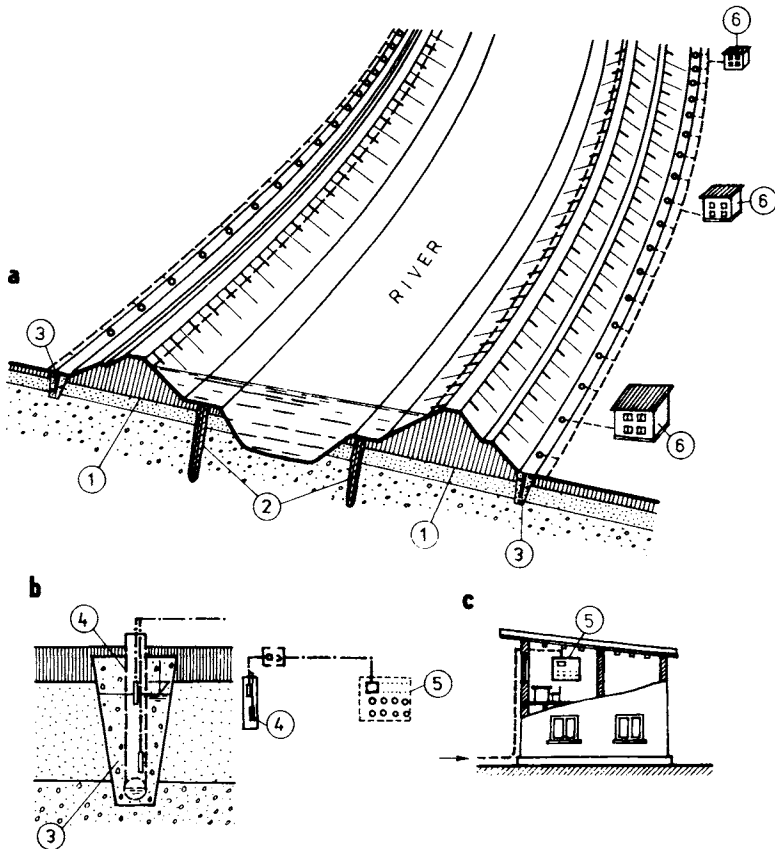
The subsoil protection and control. a — complete scheme, b — protective drain, c — watch-house; 1 — canal embankment, 2 — antiseepage element (slurry trench wall), 3 — protective drain, 4 — exploratory boring with electric contacts, 5 — control desk, 6 — watch-house.
